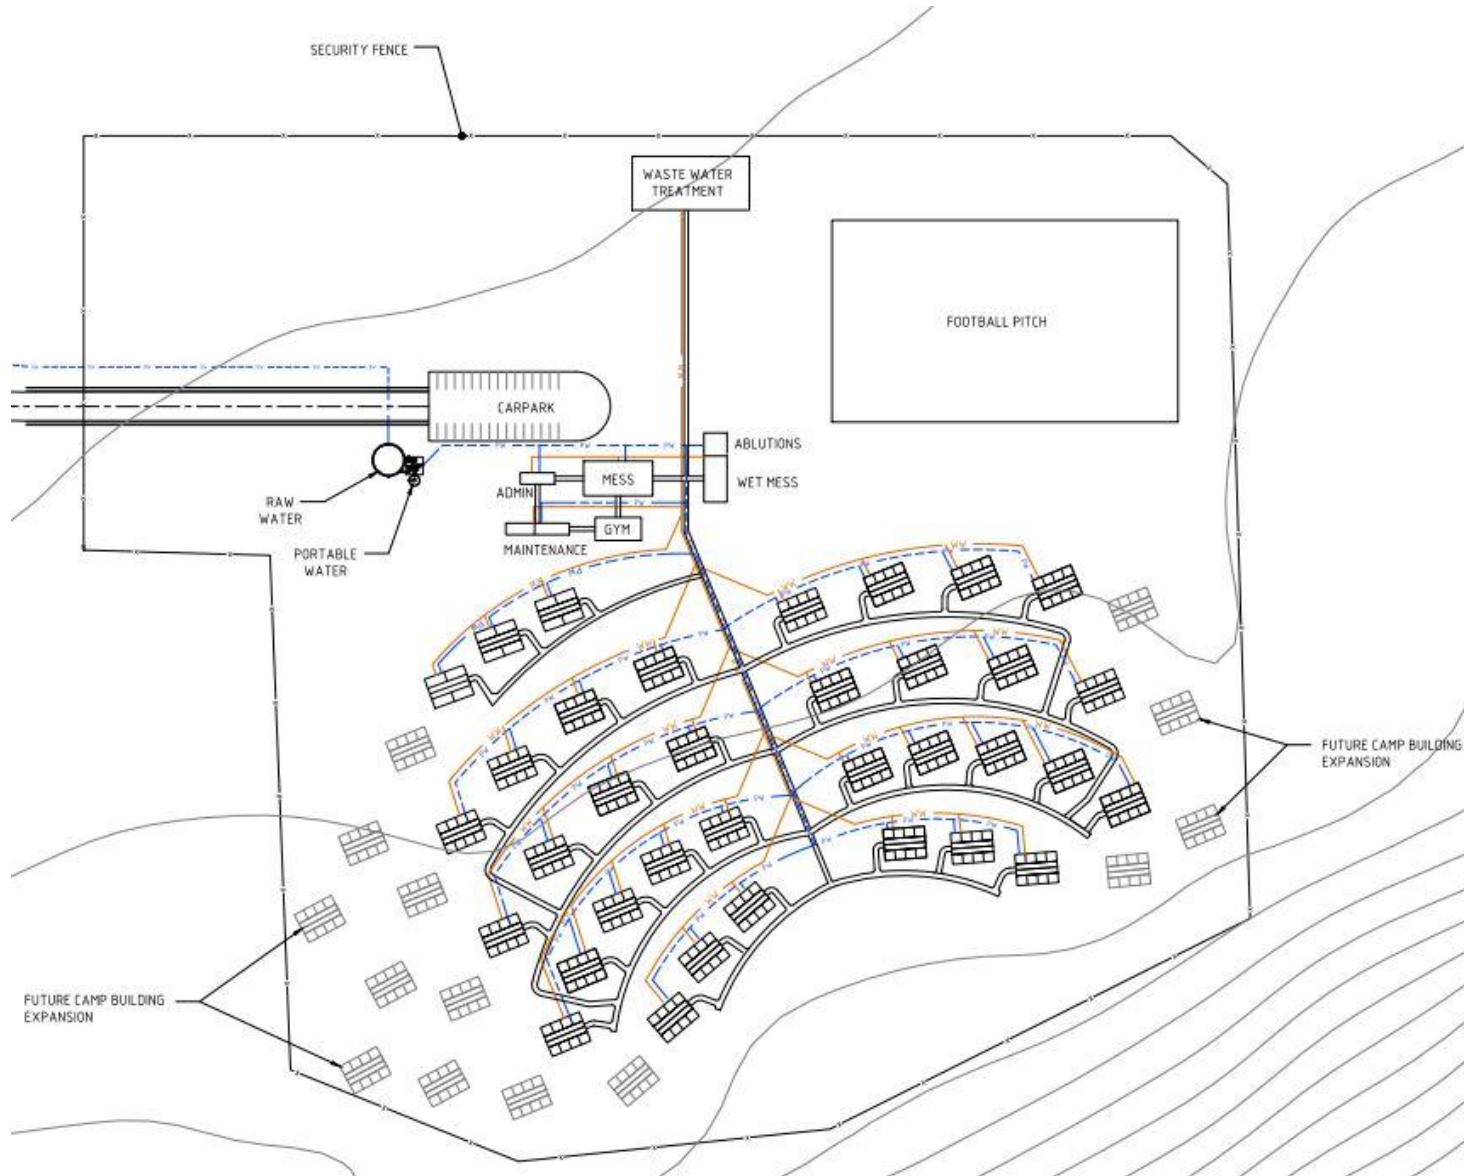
Proposed village Masterplan (Source: Equinox, 2013)
